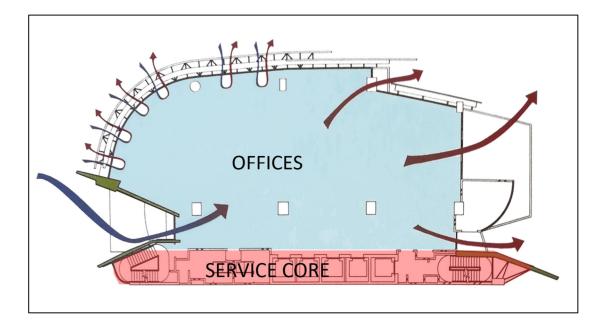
Menara UMNO Tower – typical floor plan (base drawing: TR Hamzah & Yeang Architects)
